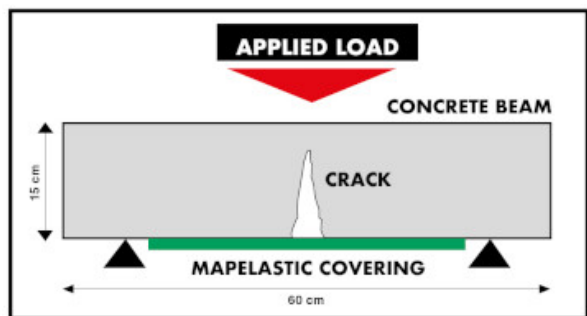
Protection of a hairline crack with Mapelastic on the underside of a concrete beam subject to flexural stress
